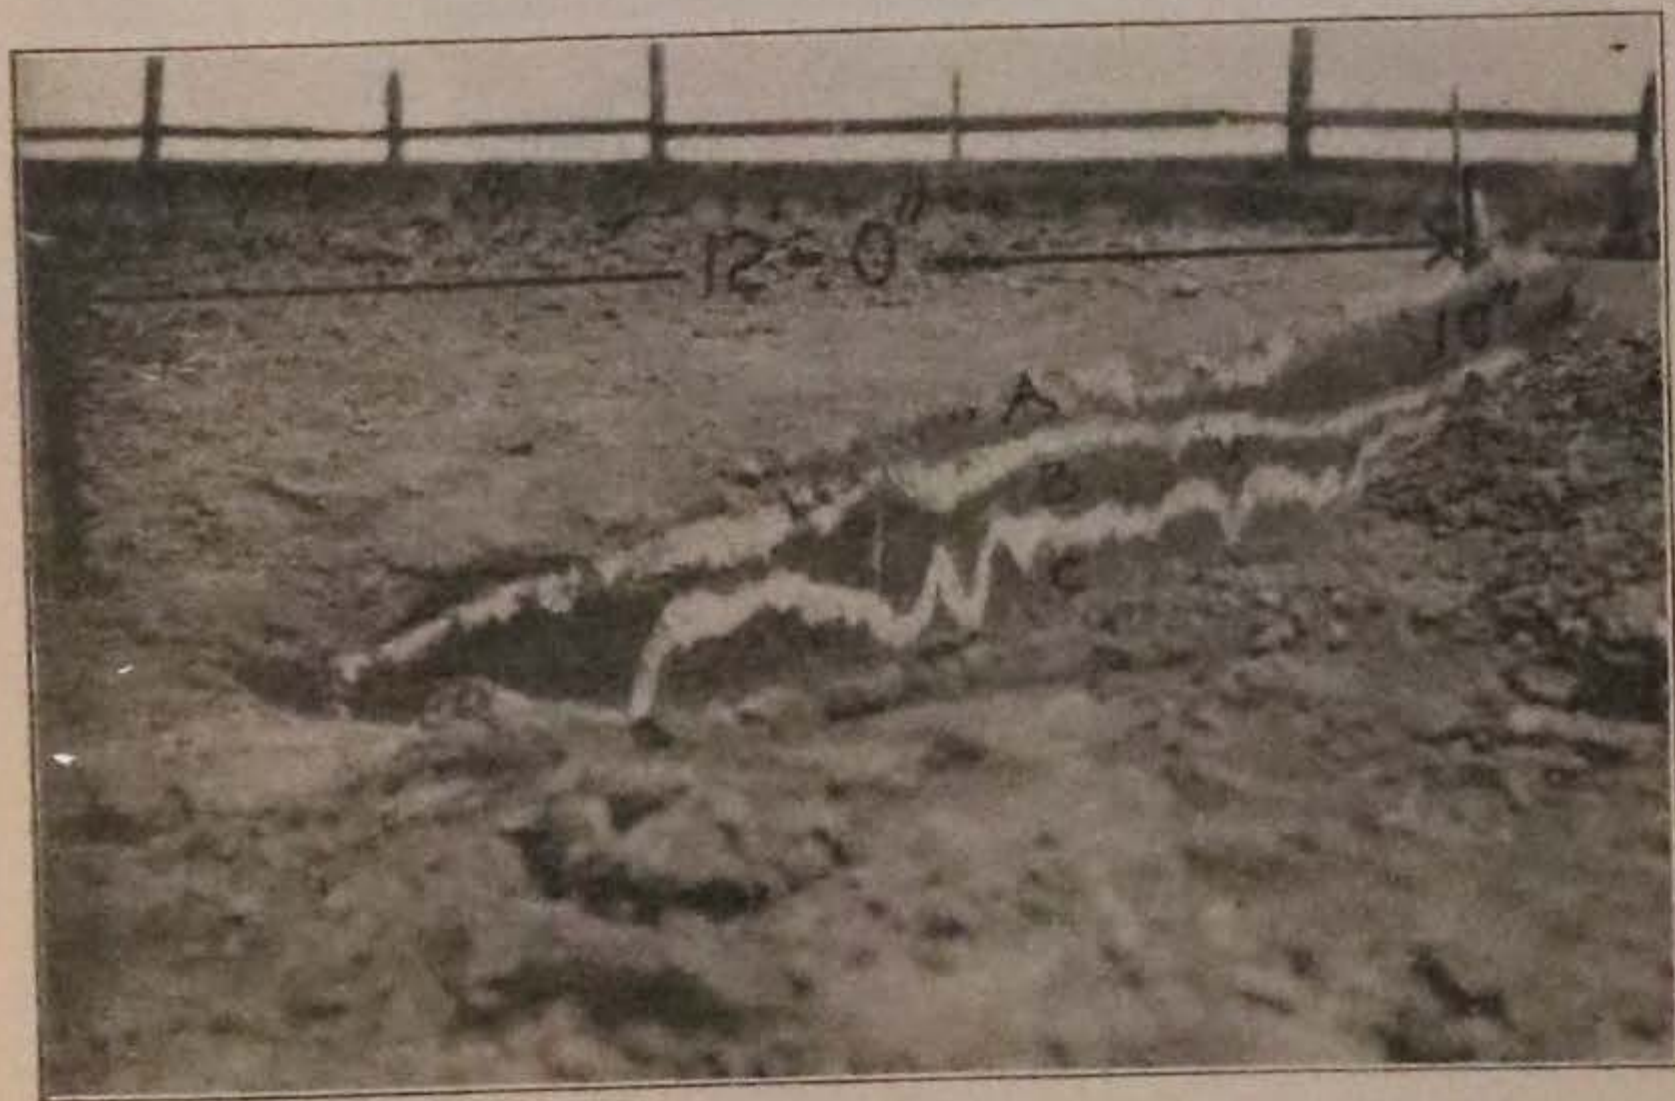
CROSS SECTION OF DRAGGED ROAD
